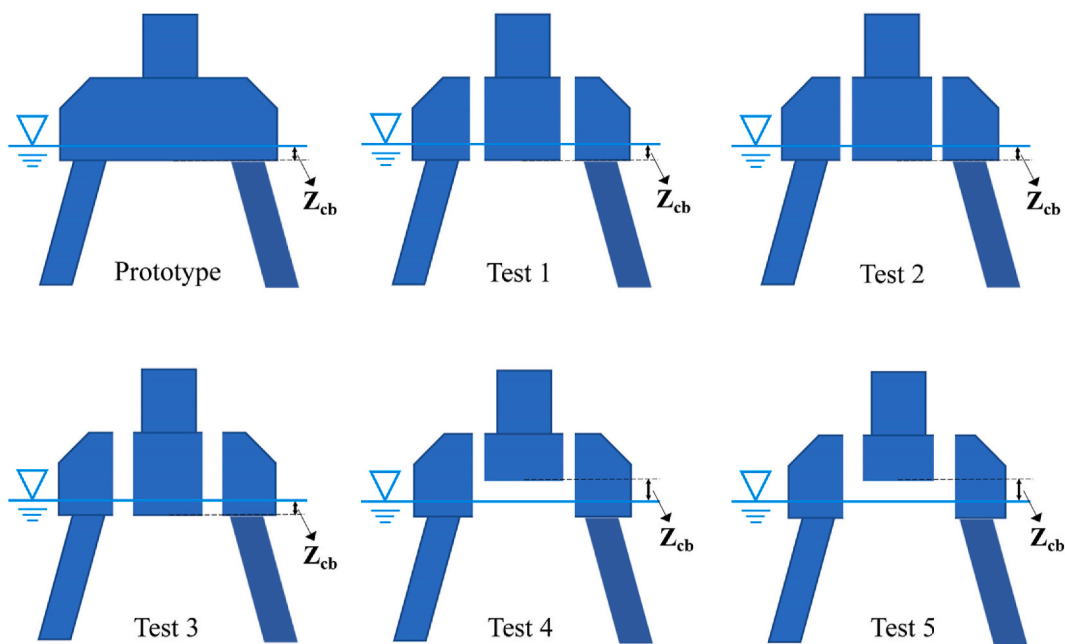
Sketches of structural section in the vertical plane that cuts Pile 1 and Pile 5.
